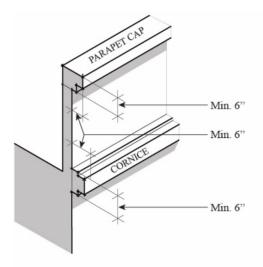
An example of roofs with a parapet cap and a cornice.
